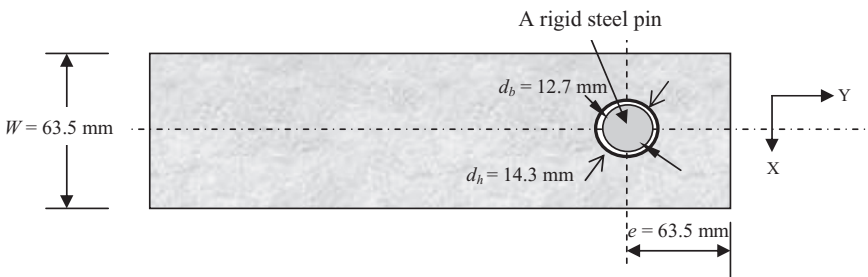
Details of single, pin-loaded PFRP joint. Source: Steffen et al. (1999)
